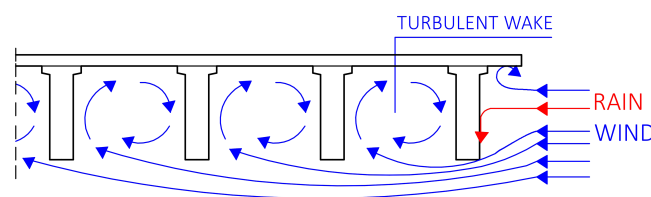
Schematic view of wind and rain direction in the NIB bridge cross section
